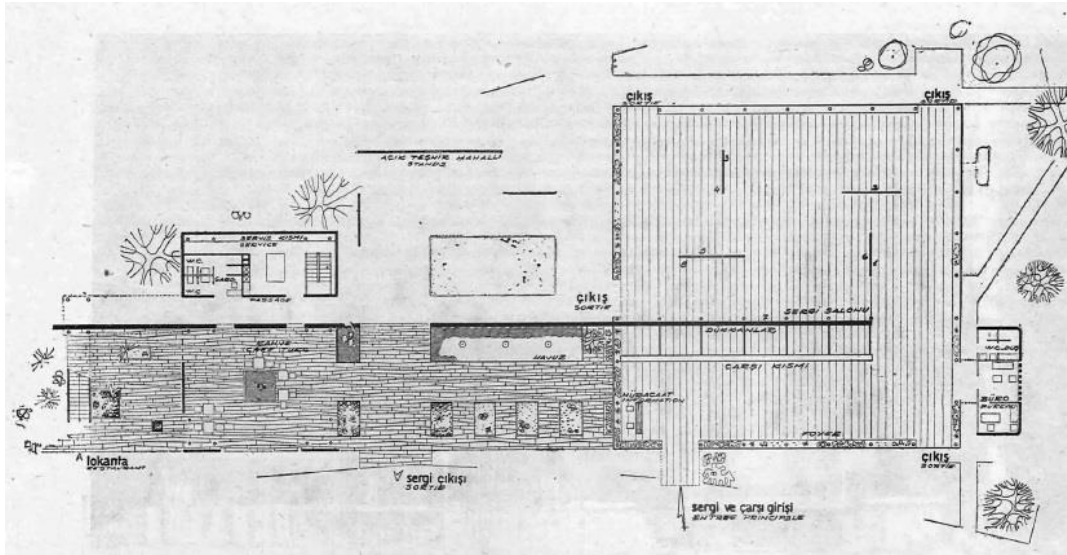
Ground Floor Plan of 1958 Brussels International Fair Turkish Pavilion
